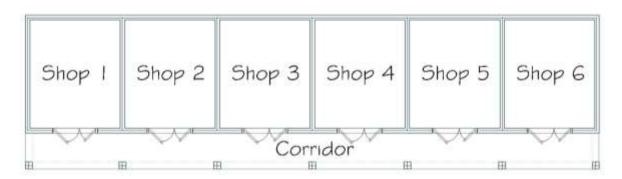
Typical ground floor plan of the lock-up shops in Wuse market. Source: Field work (2017).
